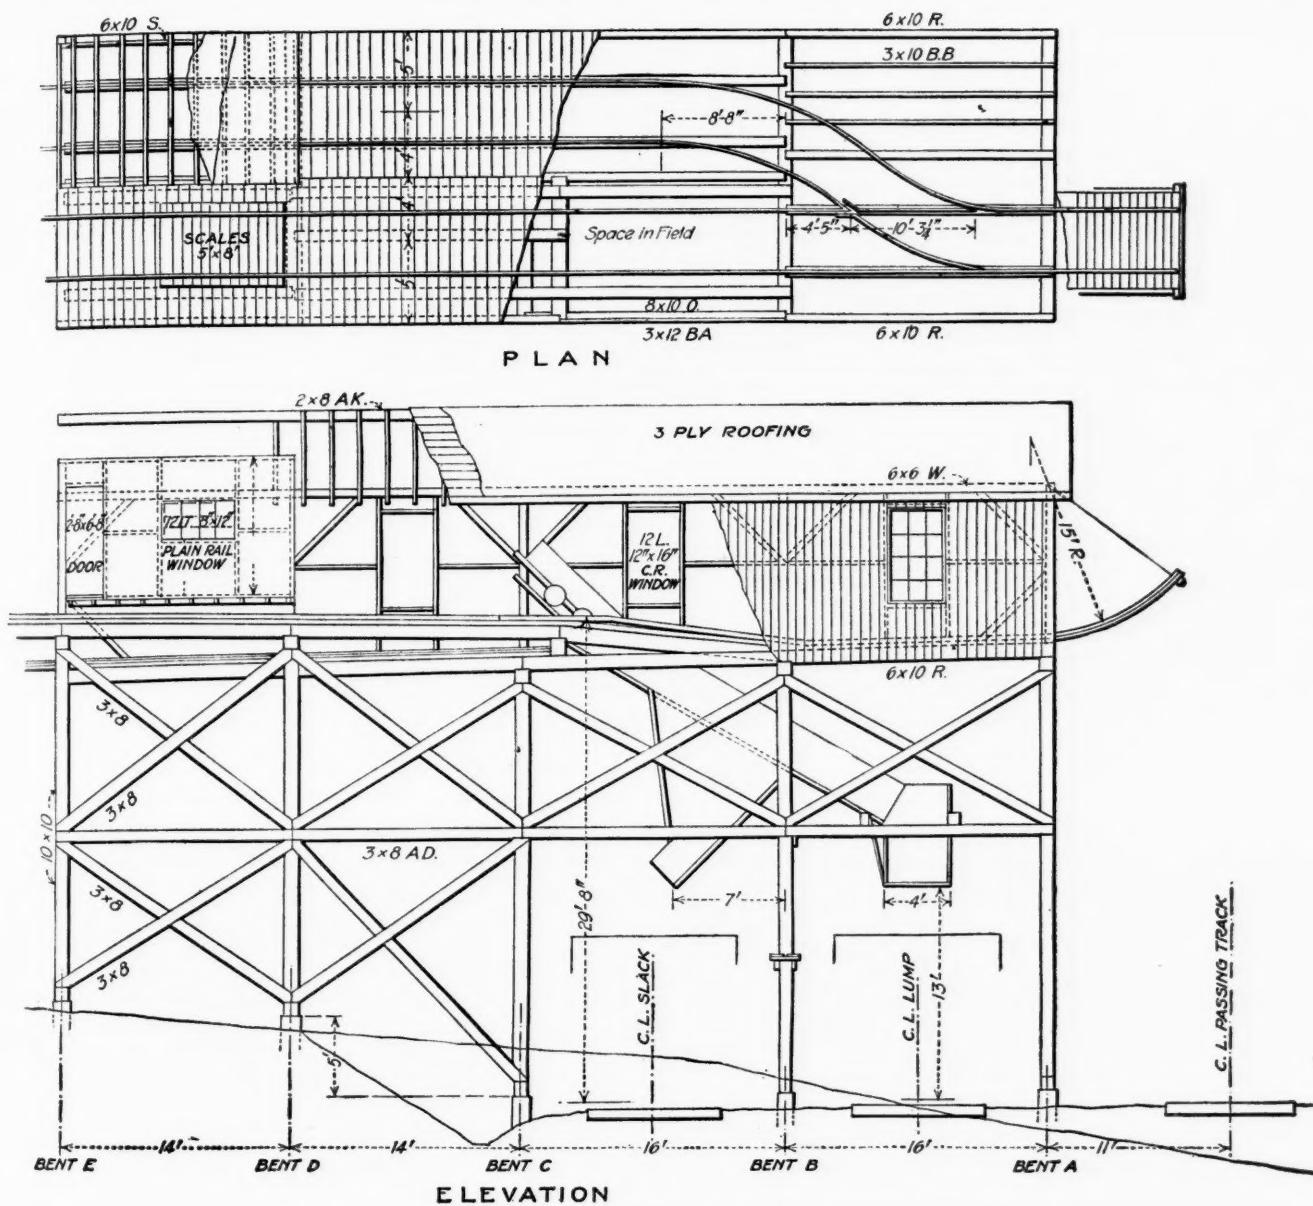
PLAN AND ELEVATION OF STANDARDIZED TIPPLE
